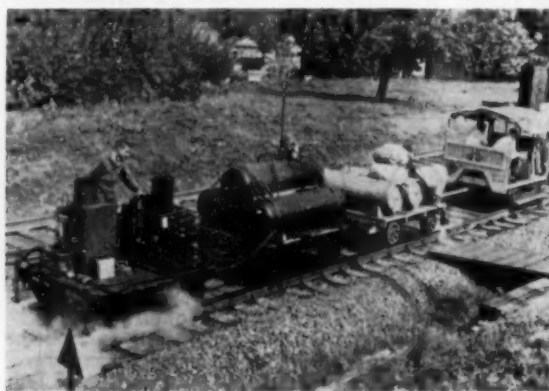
EQUIPMENT USED IN 1954 RAIL-WASHING TESTS
